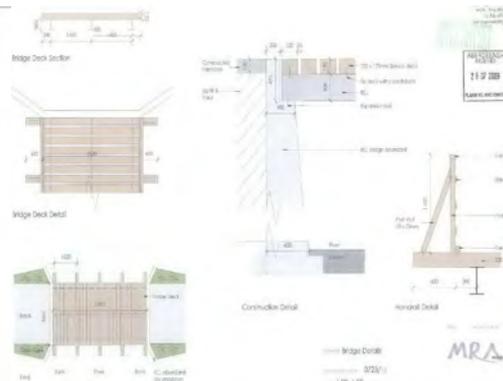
Proposed site layout Fig. 13 – Bridge details
